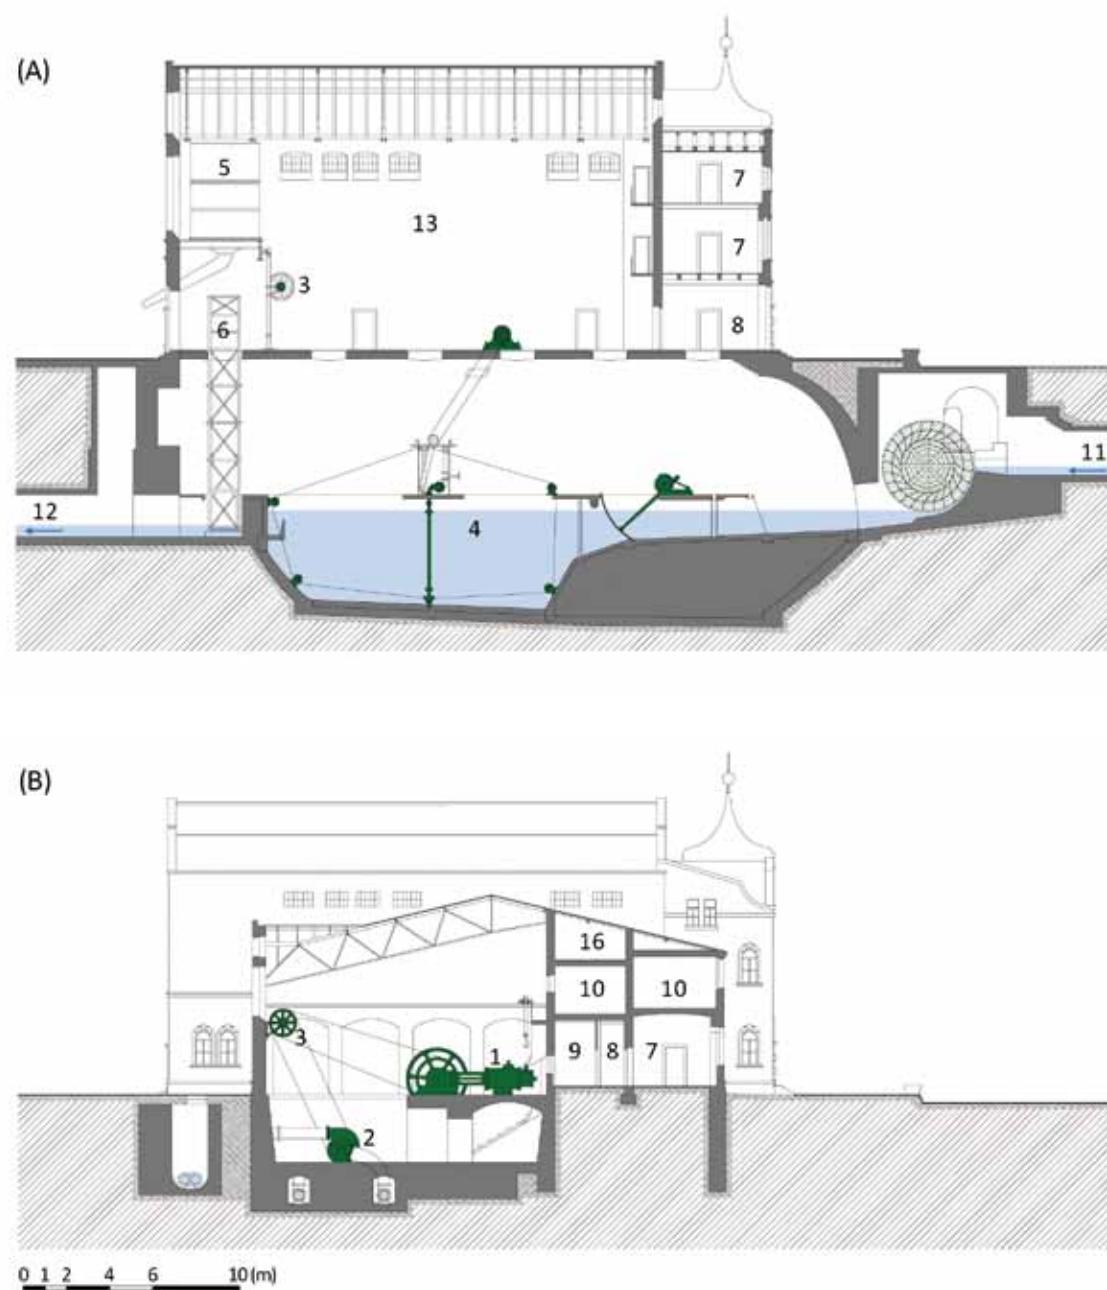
(A) and Fig. 4.261 (B) Prague-Bubeneč, old wastewater treatment plant, a cross-section of the main building: 1 – machine room, a pair of steam single-cylinder double-acting horizontal machines, 2 – machine room, centrifugal water pumps – flood control pumps, 3 – power transmission of water pumps, 4 – sand trap, 5 – sand and clean water reservoir; 6 – service lift; 7 – offices, 8 – halls, staircase etc., 9 – social and hygienic rooms, 10 – laboratories, 11 – inflow from sewers into the sand trap, 12 – outflow from the sand trap into sedimentation tanks, 13 – sand trap hall, 14 – boiler and coal rooms, 15 – two compound Cornish-type flued boilers, 16 – storage space, archive etc., 17 – switch room and storage space, 18 – piston water pumps, 19 – sludge reservoir, 20 – chimney for the removal of combustion products from boilers, 21 – ventilation chimney, sewer odour removal system. Diagram by Radek Mišanec, 2021 (modified according to: archive project documentation).
